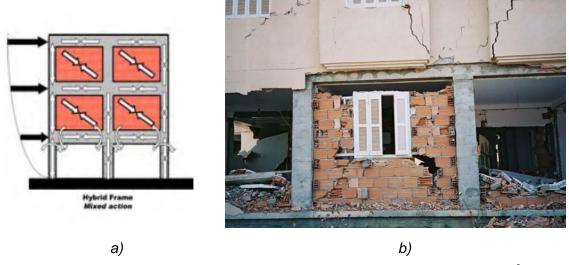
Soft storey mechanism: a) vertical discontinuity in masonry infills<sup>2</sup>; b) building damage in the 2003 Boumerdes, Algeria earthquake<sup>3</sup>.
